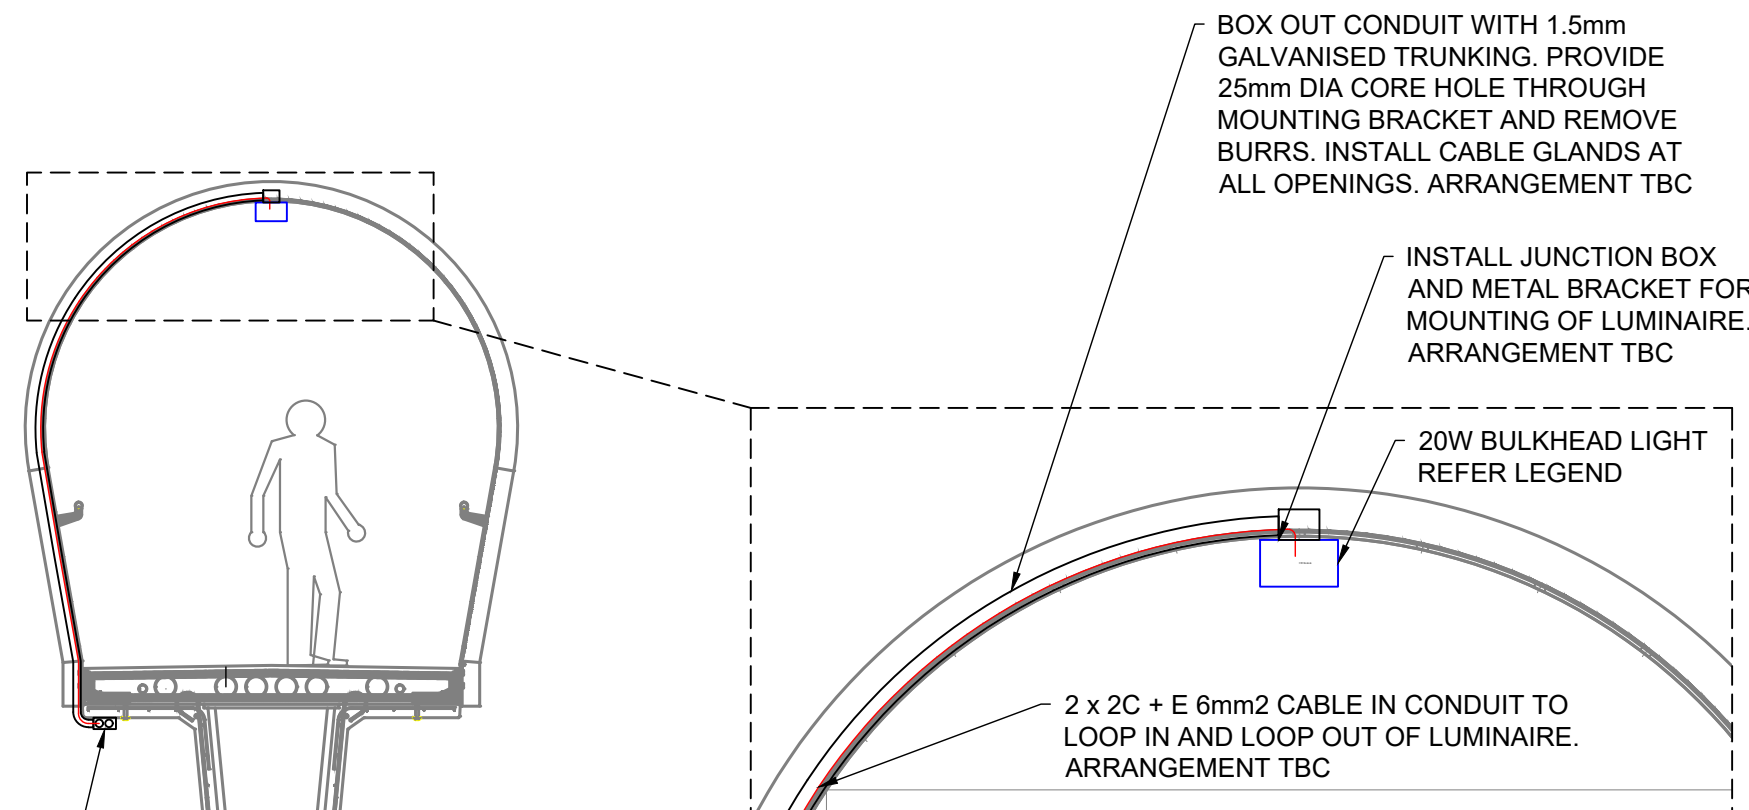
RAMP TYPICAL ARRANGEMENT
